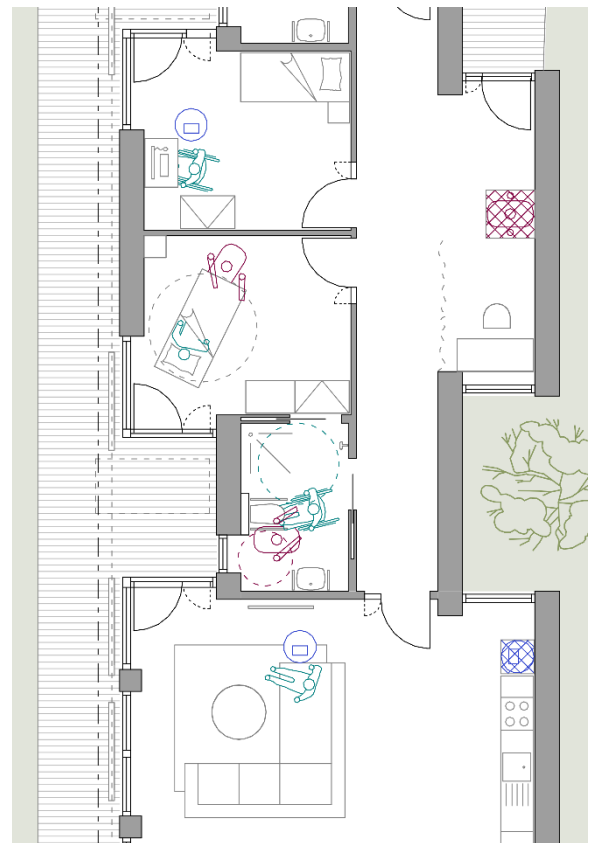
Detail of the revised design of the building – Type B – Family type house. Part of the bigger flat. (Source: Rollová, Bošková Filová, 2023)
